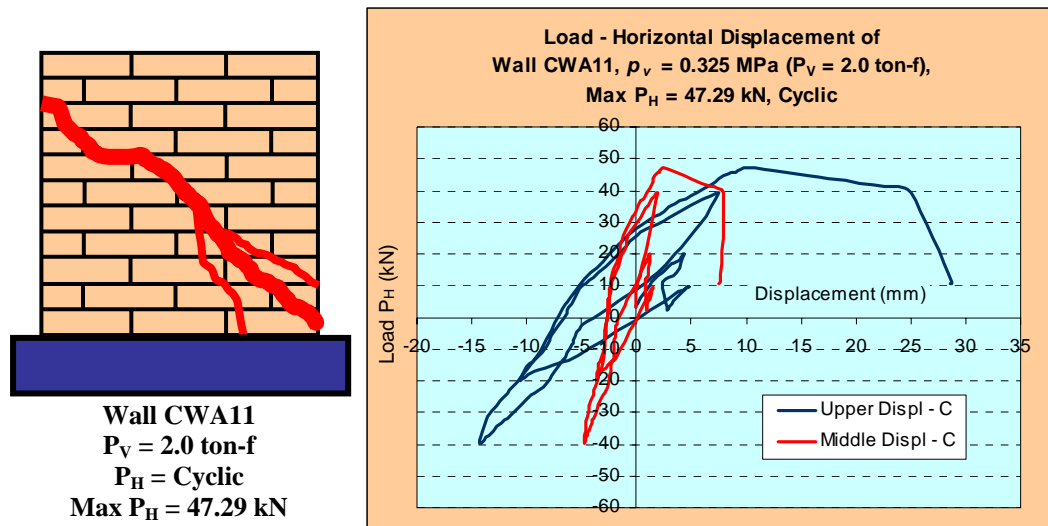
Failure pattern and load-displacement of wall CWA11
